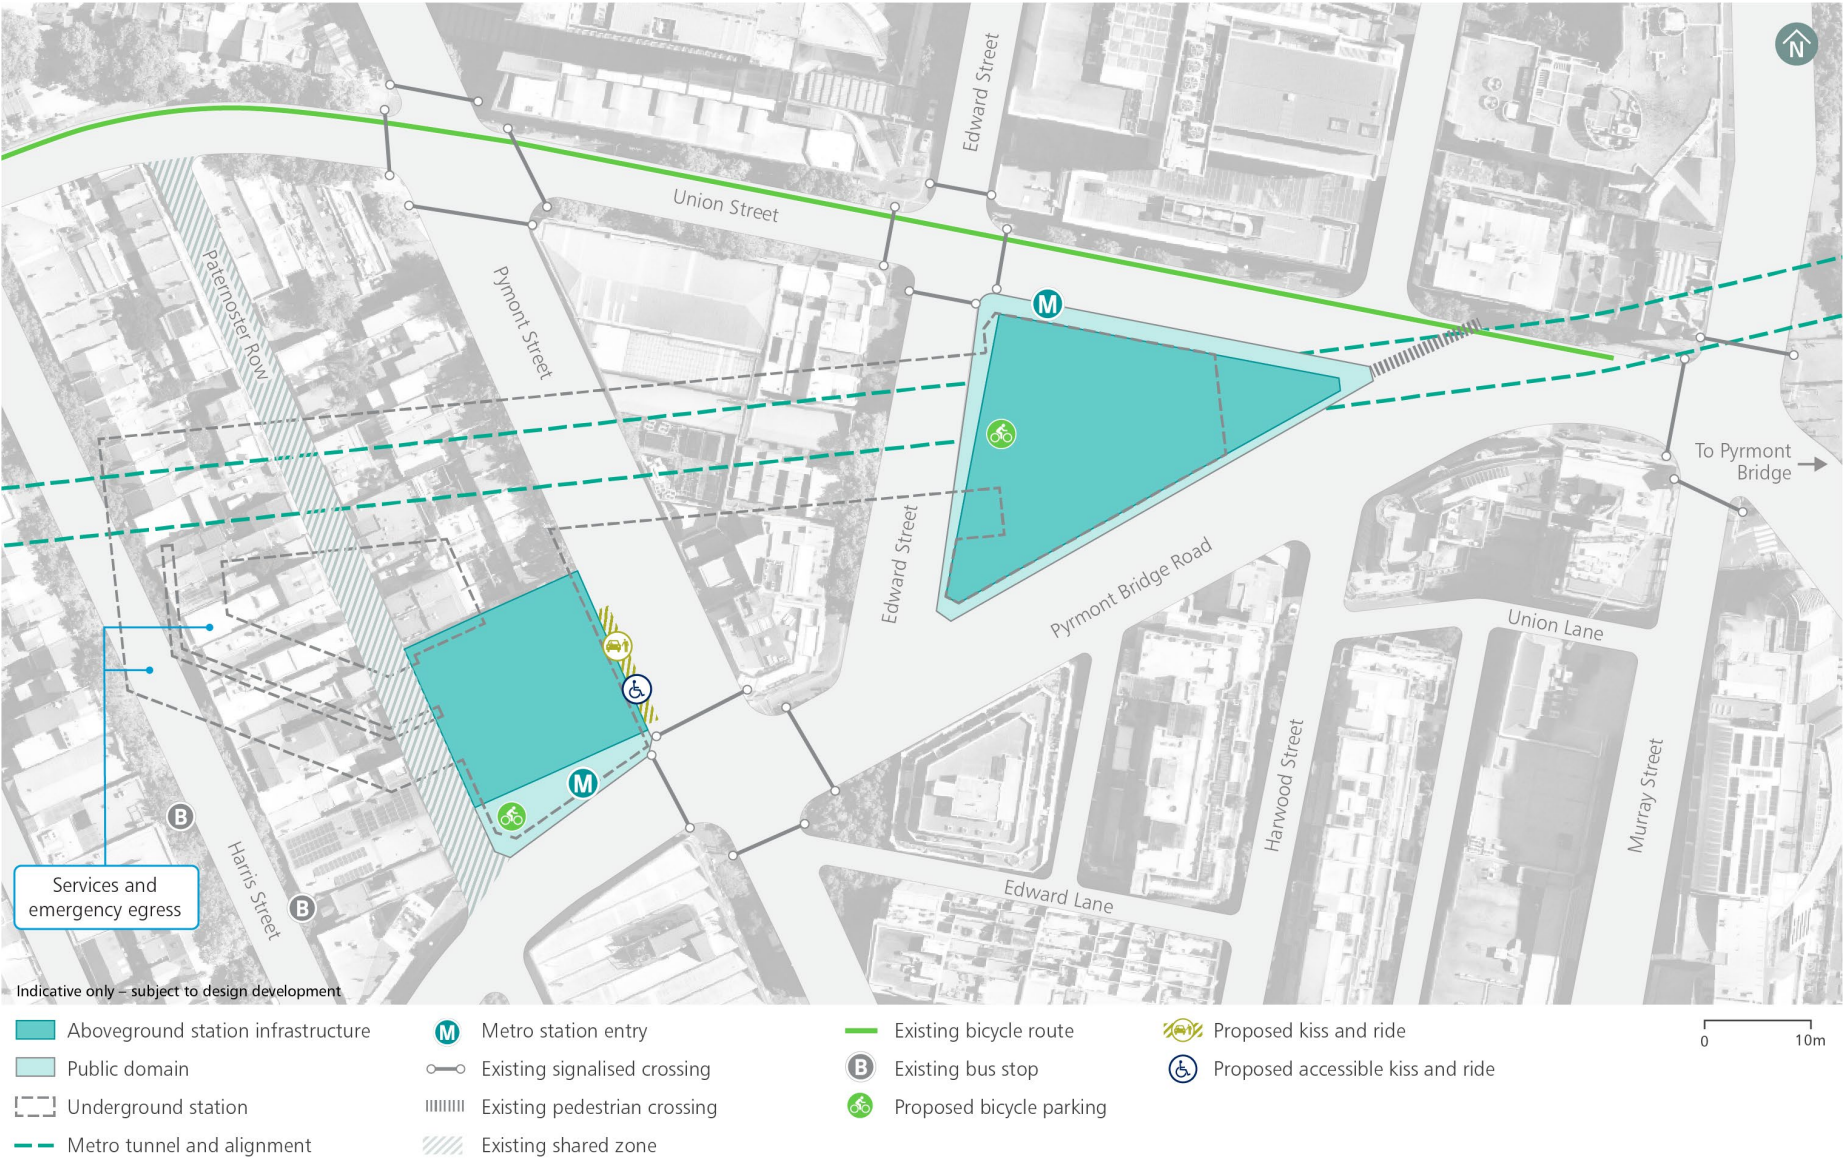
Indicative layout and key design elements – Pyrmont Station
